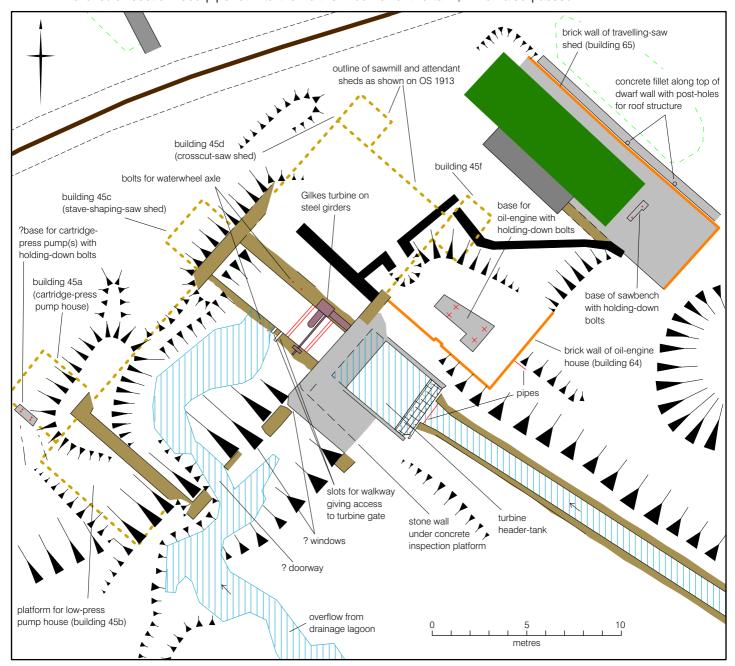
EH interpretative plan of the sawmill and associated buildings. (For key to conventions, see Fig 142)
